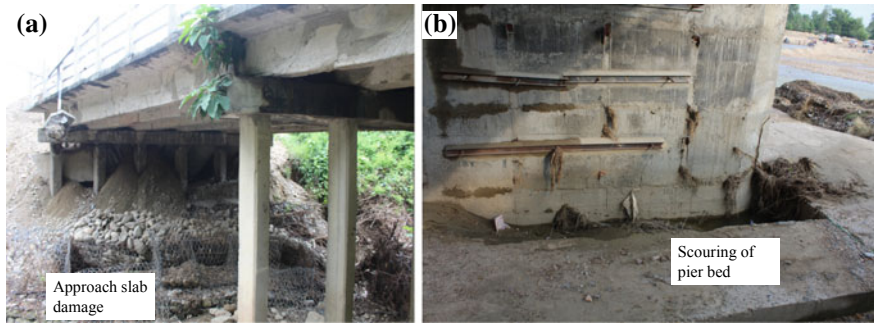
a Approach slab damage due to the flood, b scouring of pier base
